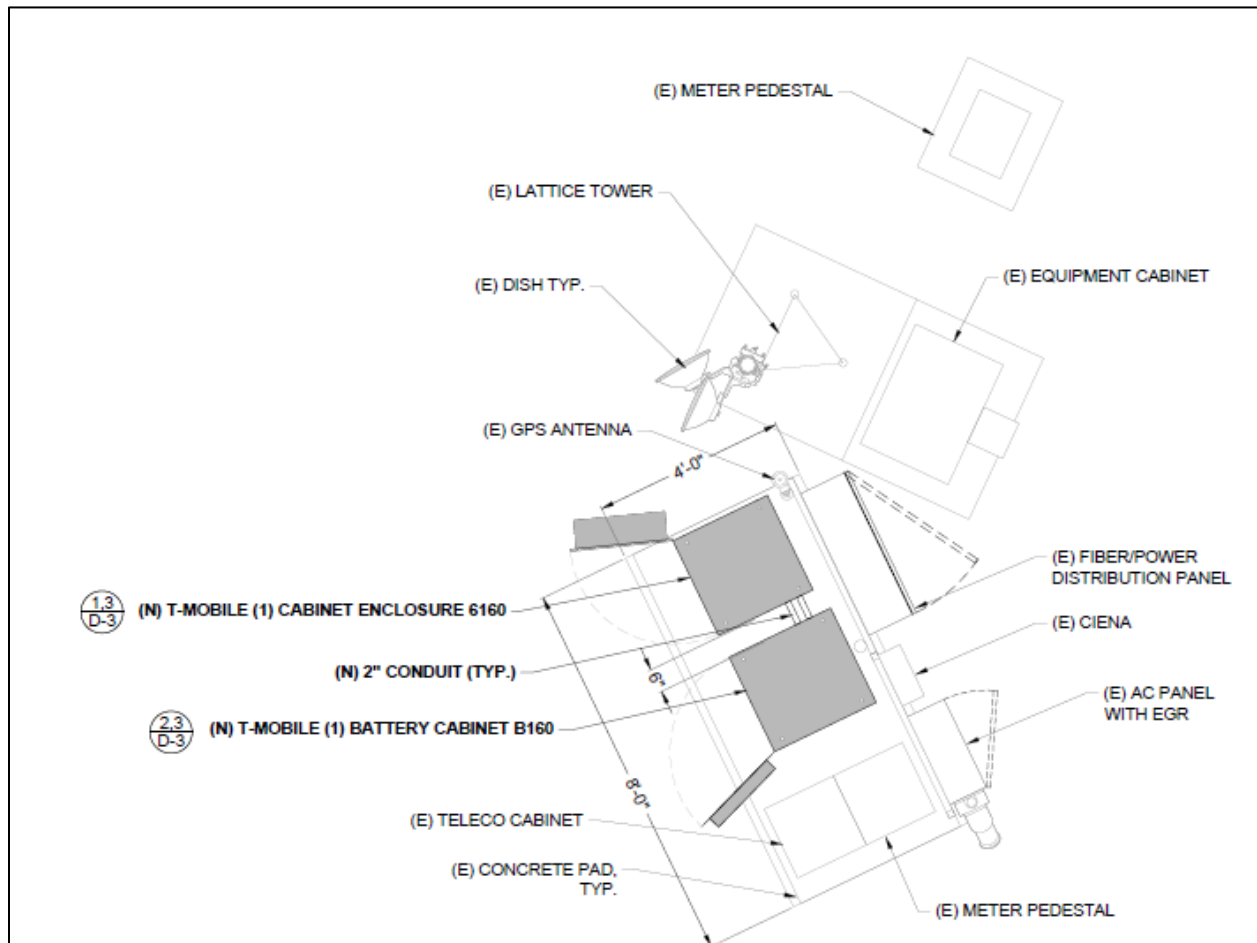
Proposed equipment layout (Source: Plans, page A-2, panel 1).
